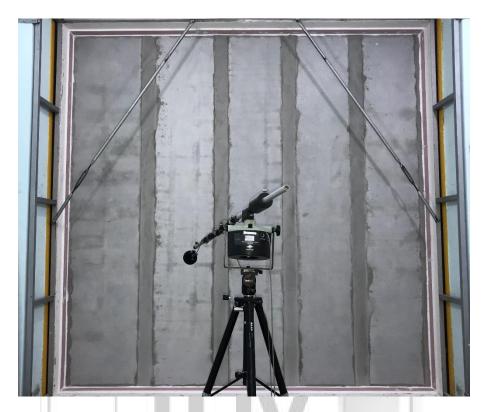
"GEG ECO" lightweight wall panels system facing source room
